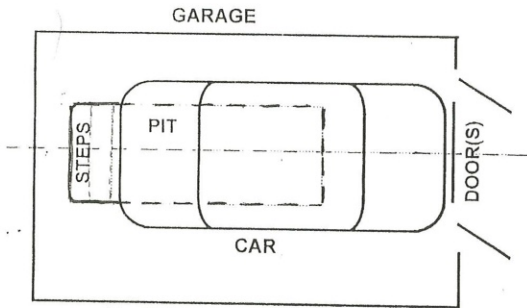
Ideally locate the Pit allowing full length of vehicle inside garage with garage doors shut and sufficient safe access in and out of pit via steps.
